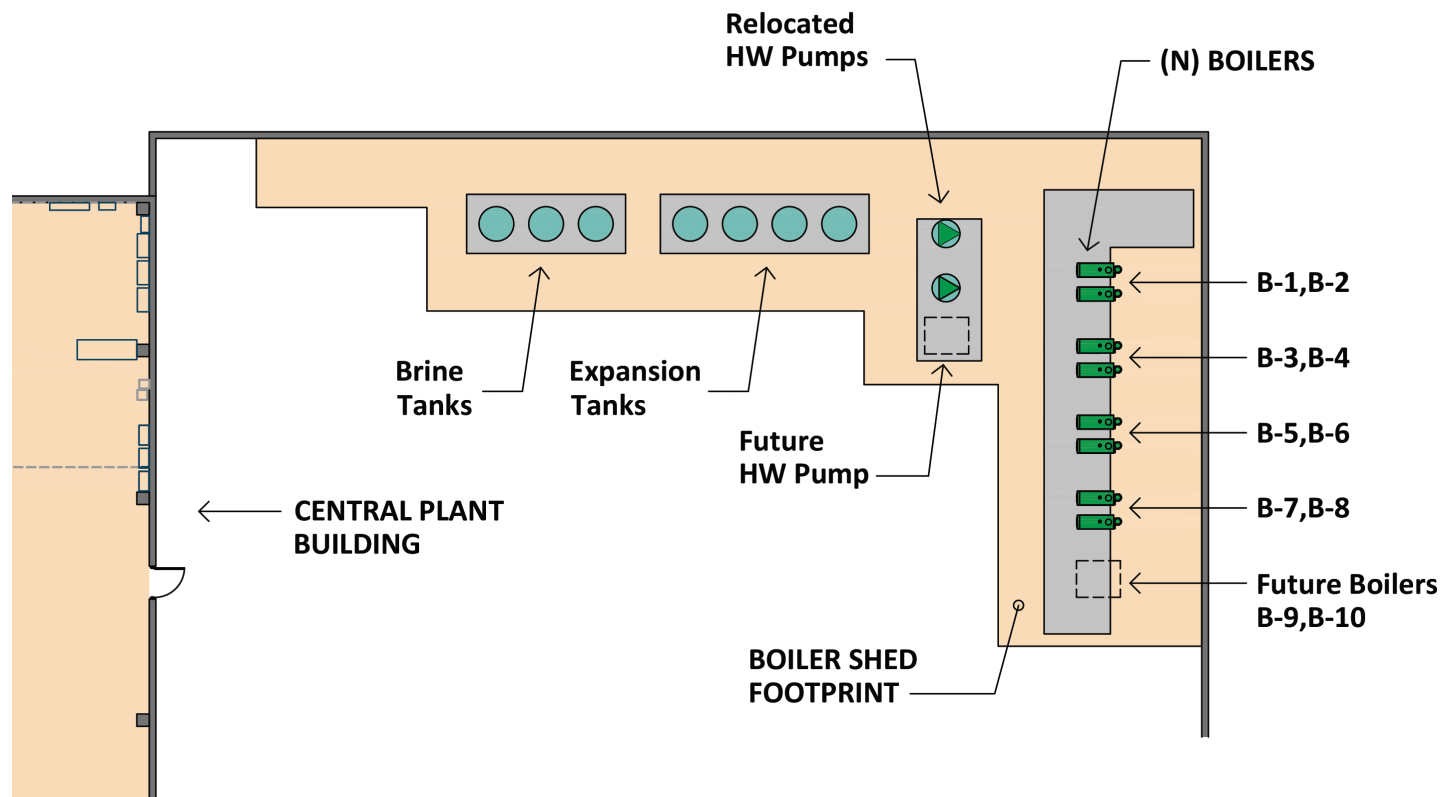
BOILER LAYOUT AT CENTRAL PLANT
